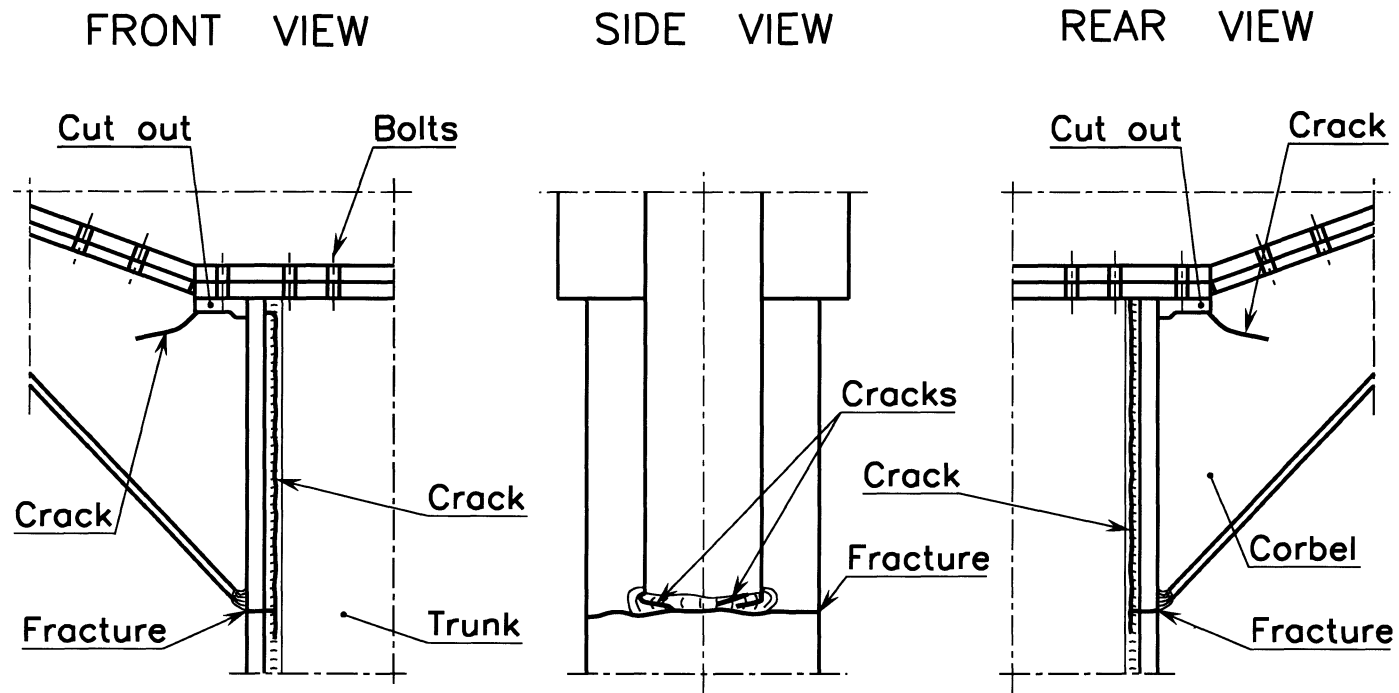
Cracks and fracture on pier 6 (only damaged welds are represented).
